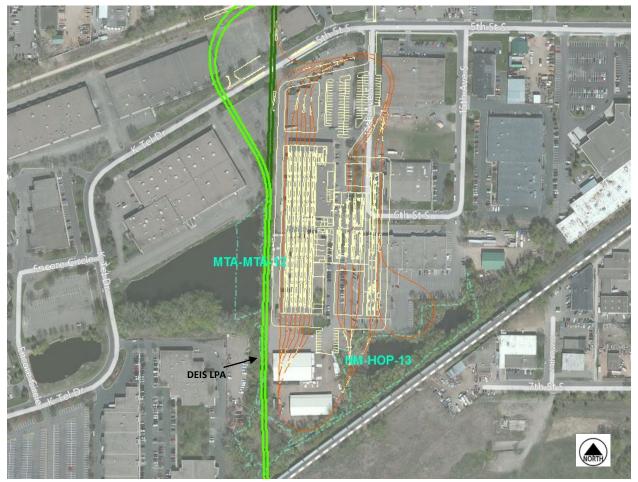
Hopkins Operations and Maintenance Facility - Initial Layout
